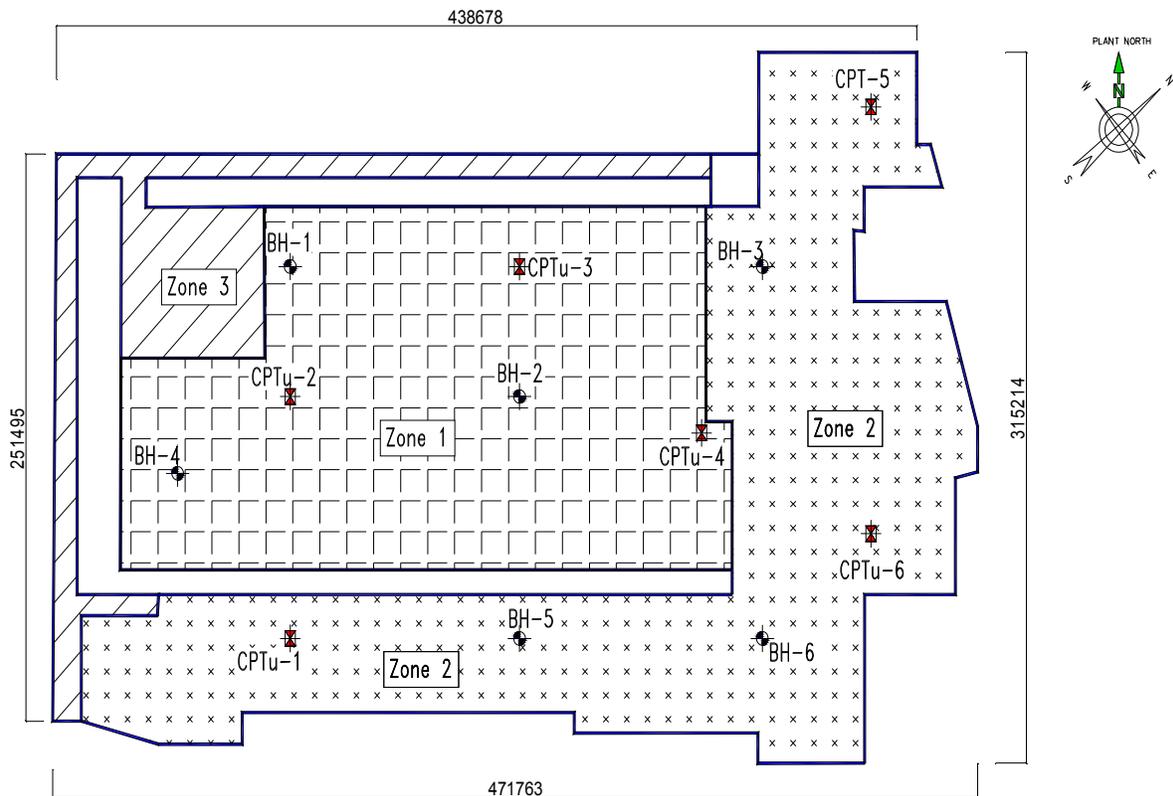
Plan layout of zones and field test locations (BH: boreholes, CPTu: cone penetration tests and vane shear tests are taken in BH-1, BH-3, BH-4, BH-5) before soil improvement in PVTex.
